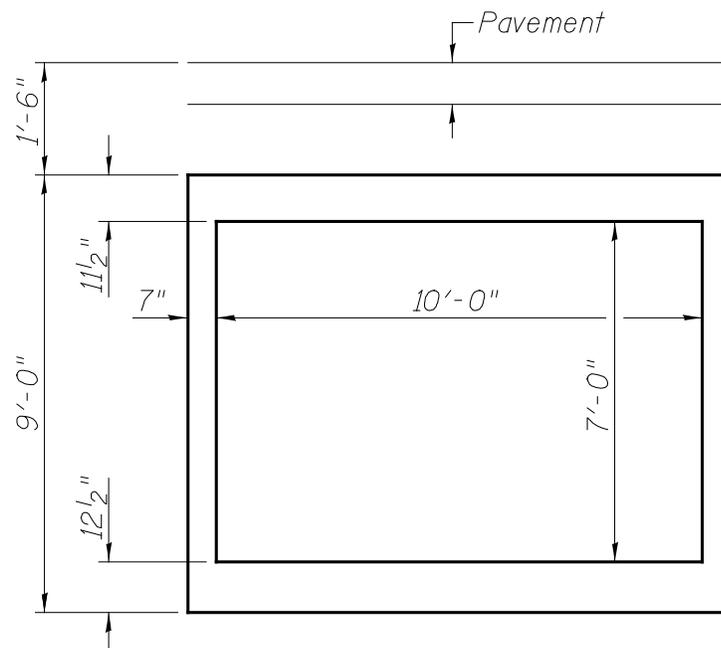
Worked Example 2 & 3 – Culvert Cross Section
